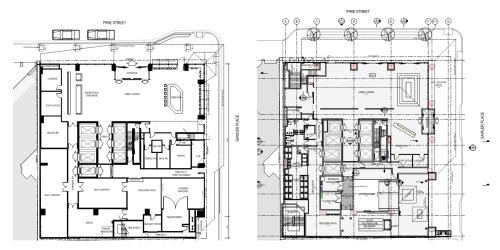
Ground floor plan: new proposed design (L), CFD simulated previous design (R)
